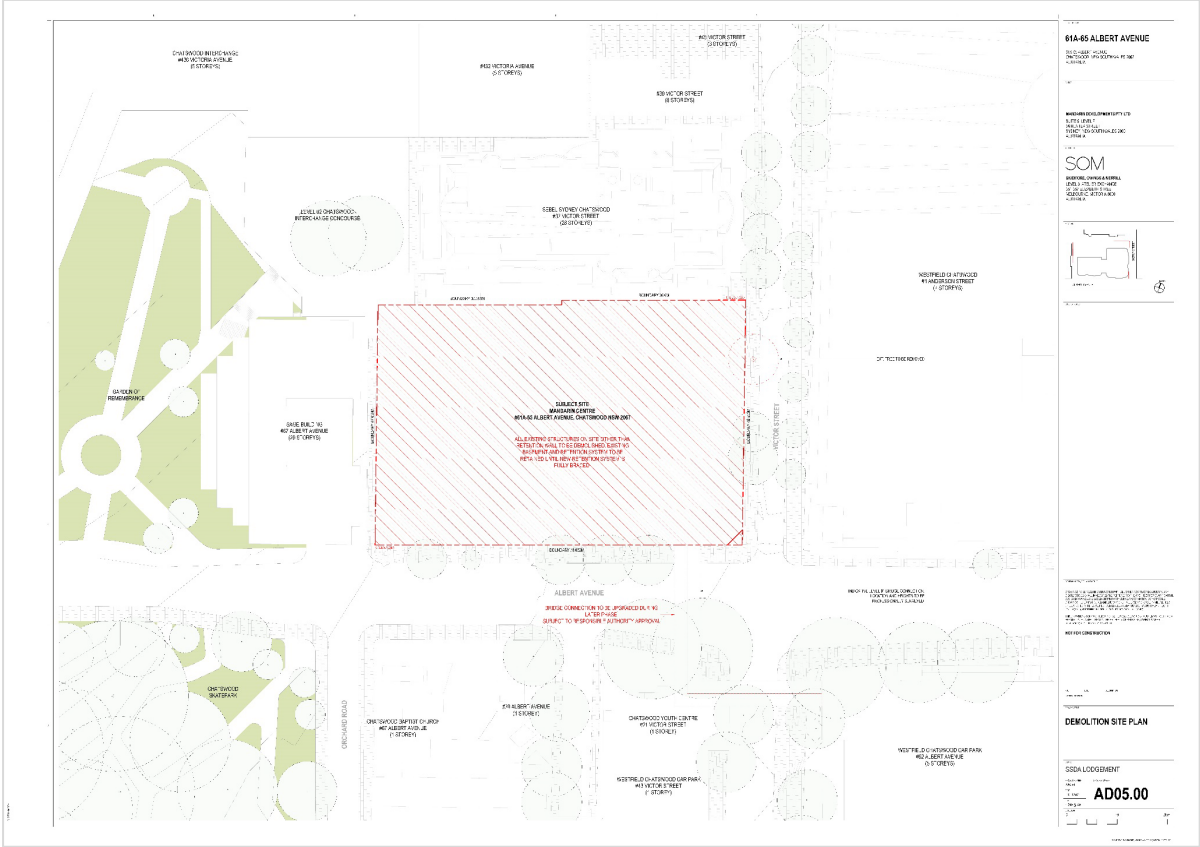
Demolition plan. (Source: SOM. 2025)
